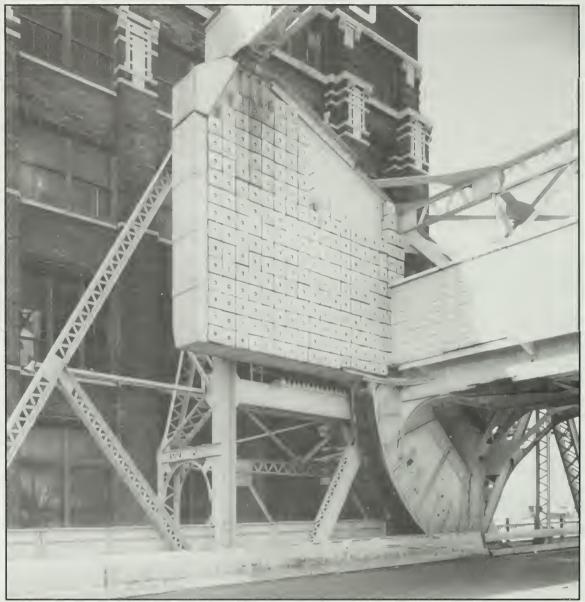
Cermak Road: Chicago River Bridge (1906), detail of counterweight, Chicago. Photo by Jet Lowe, HAER.
